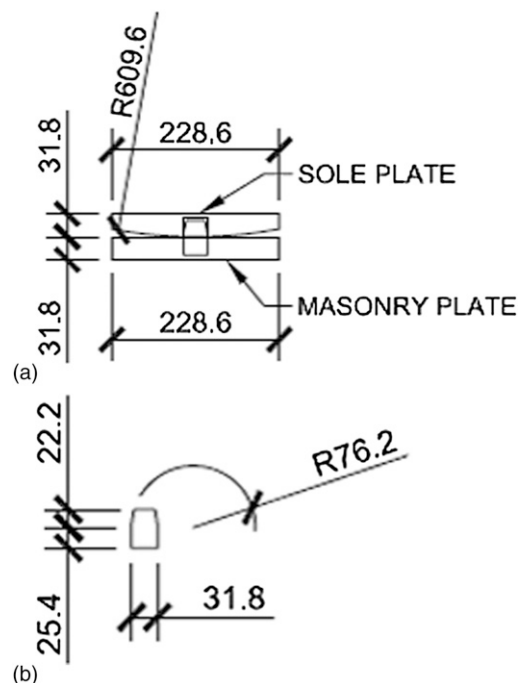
Fixed bearing section cut parallel to bridge longitudinal axis and pindle detail (in mm): (a) longitudinal section; (b) pindle detail
